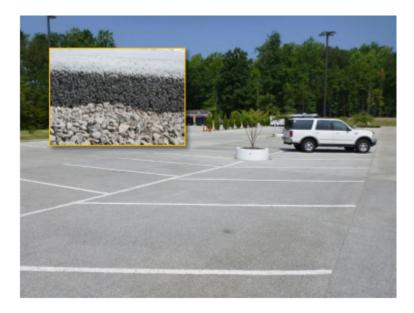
Pervious interlocking concrete pavement in Williamsburg, VA (Hein 2016, 1).
